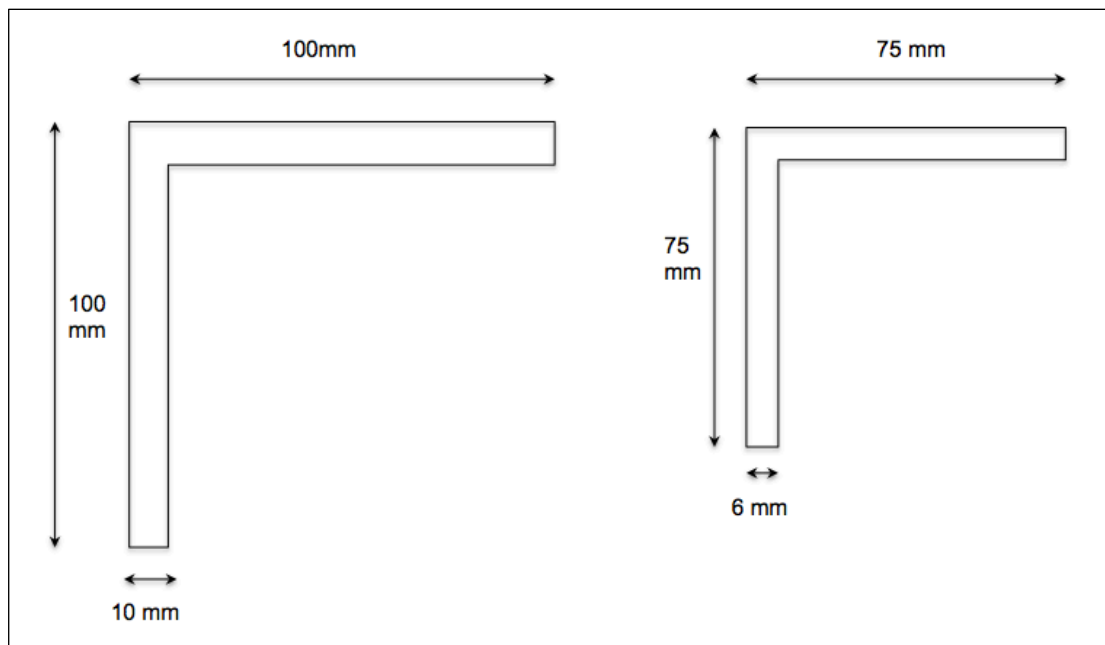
Specimen dimensions: equal angle sections (root radii not shown)
